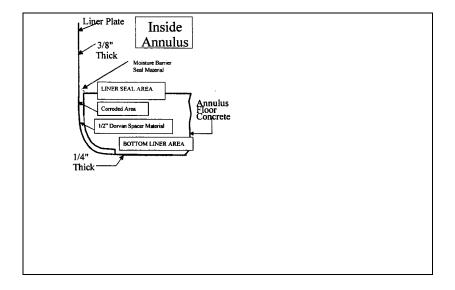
Annulus Floor (Crane Wall Not Shown—Located 13 feet to the right of the vertical liner plate)
